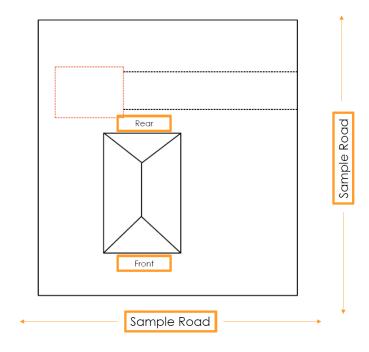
Example of appropriate new outbuilding placement on a corner property with side yard driveway access
